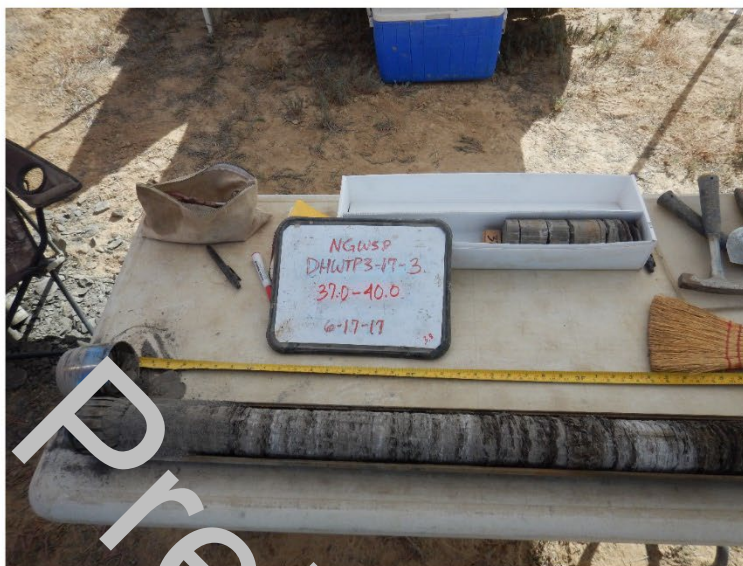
/17/2017 NGWSP, SJWTP, DHWTP3-17-3 (37.0-40.0 feet). Photo By: P. Gardner
